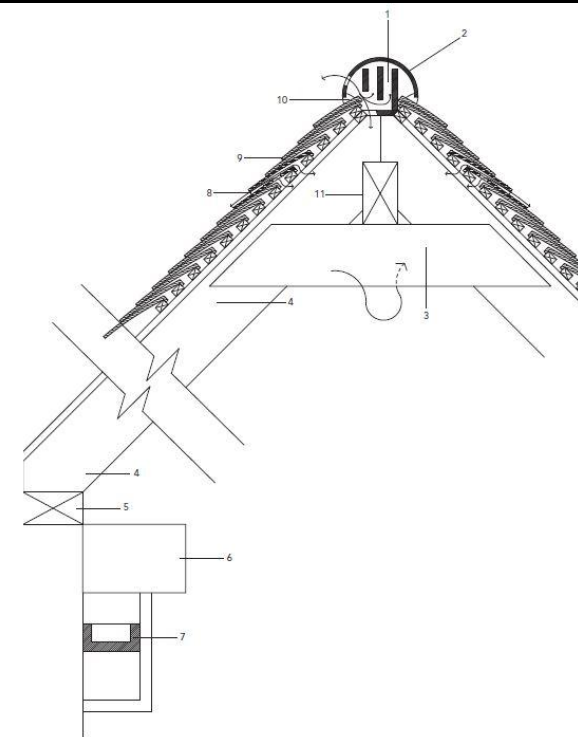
Example of build up in roof space for crevice dwelling bats in an uninsulated roof space.
